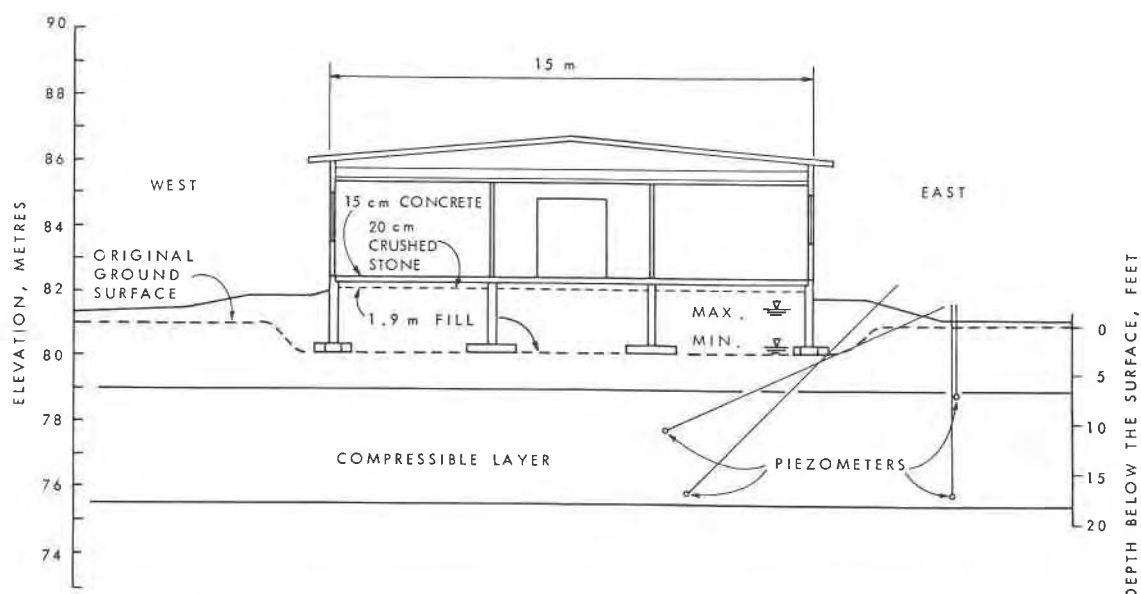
Cross-section through the foundations of the Accommodation Block.
